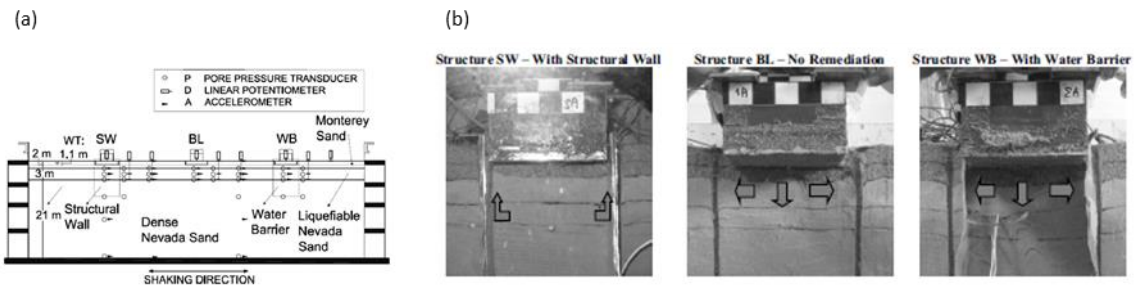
(a) Model configuration and (b) photographs of the examined systems: with a perimetrical structural wall around the foundation, without any remediation and with a flexible water barrier around the foundation (Dashti et al. 2010c).
